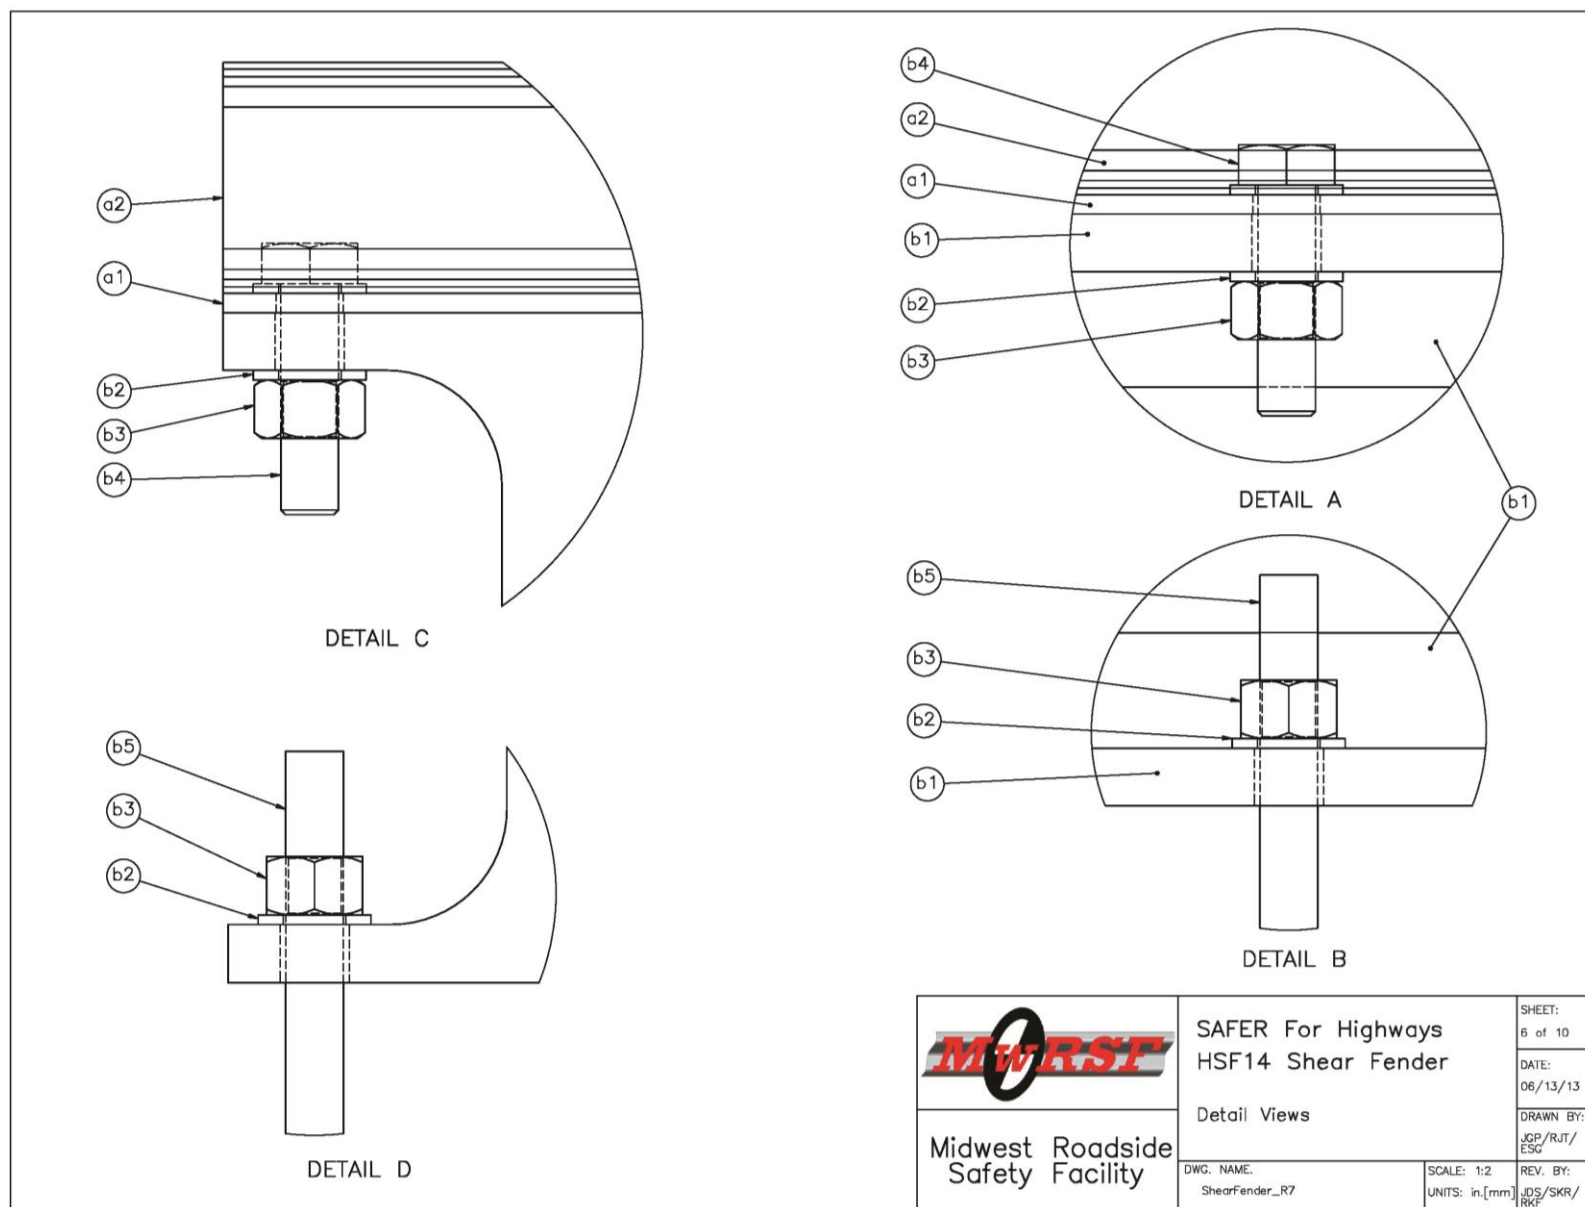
System Detail Views, Test Nos. HSF14-1 through HSF14-5
